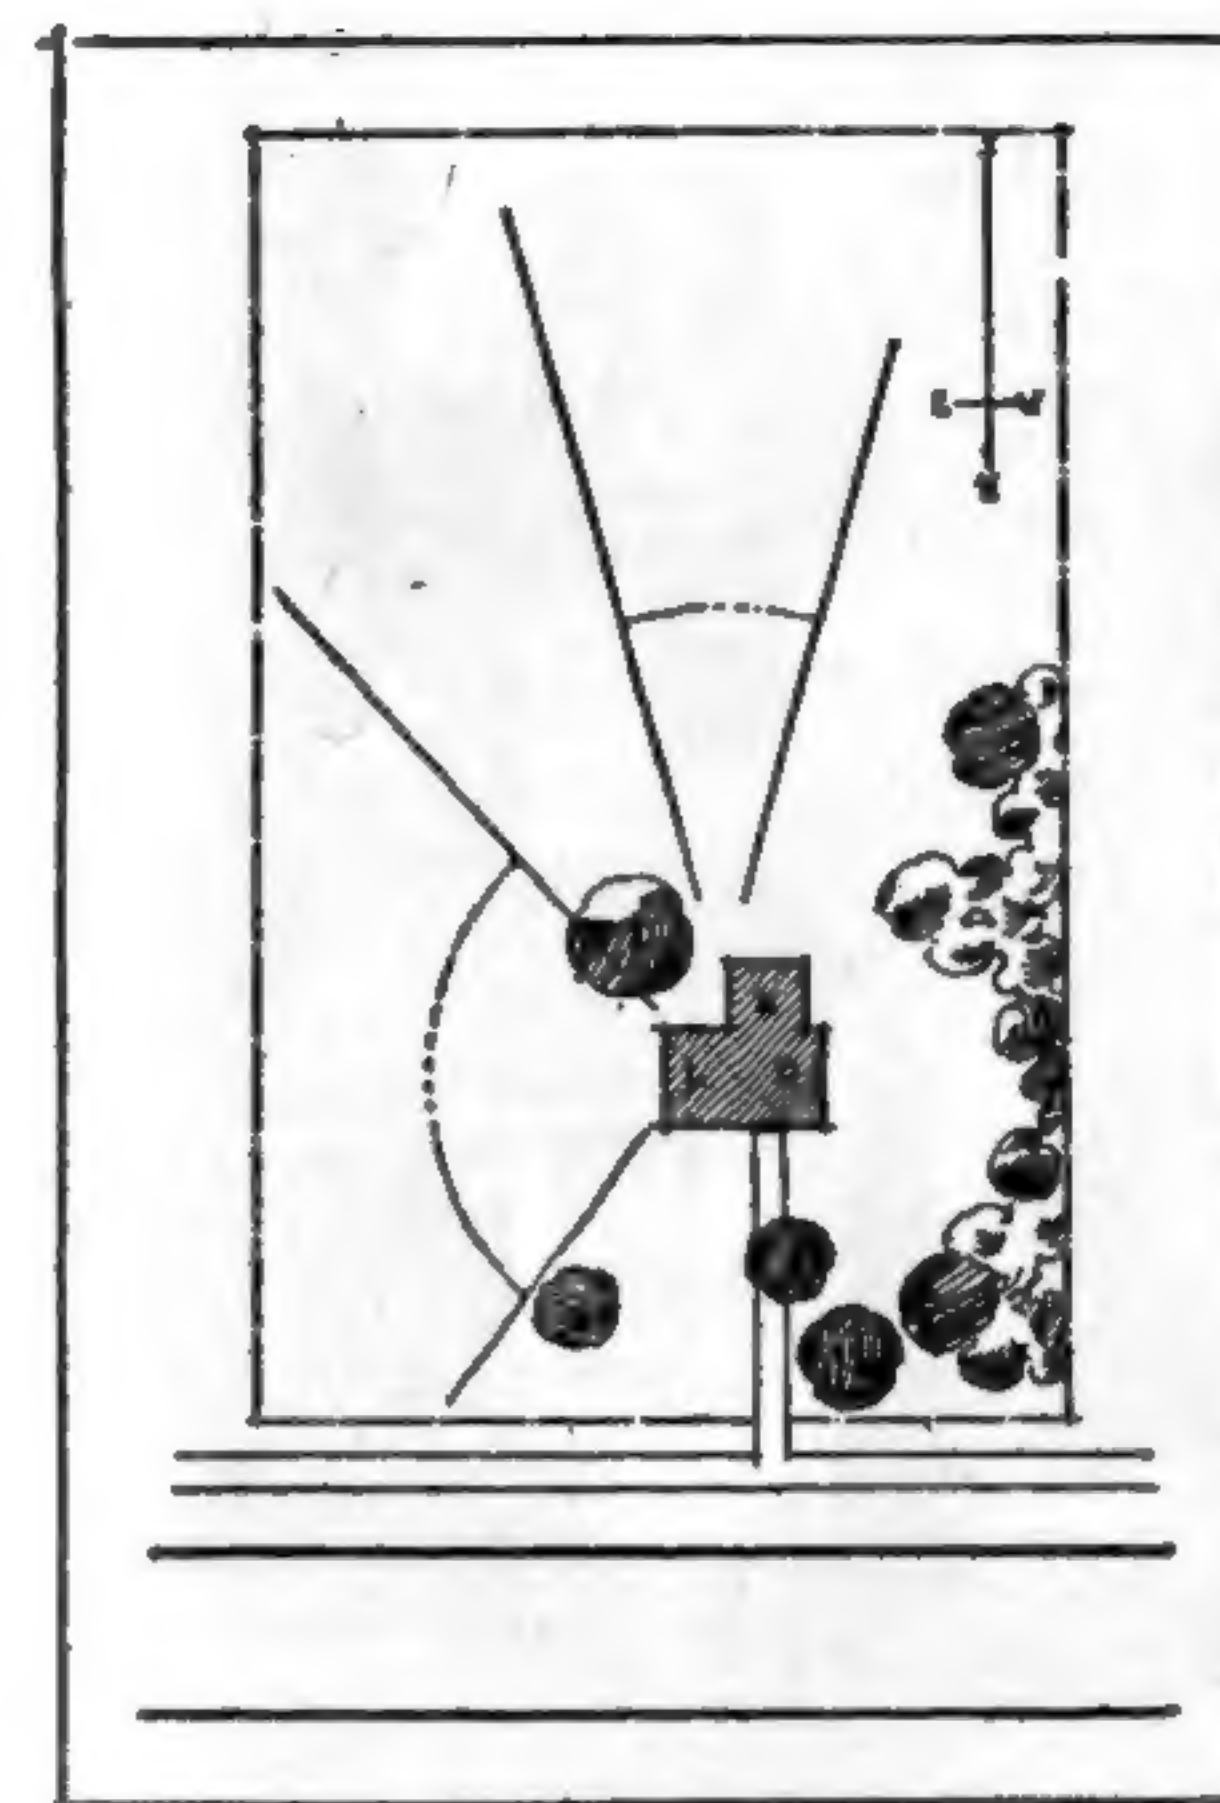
FIG. A — Planting plan to insure best effect of shade, outlook, protection, and privacy on a lot facing north
